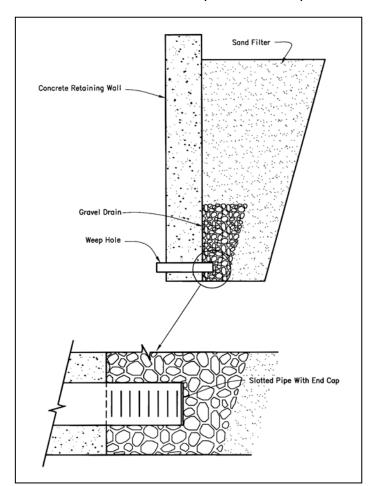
VERTICAL DRAIN, WEEP HOLE, AND TOE DRAINS
